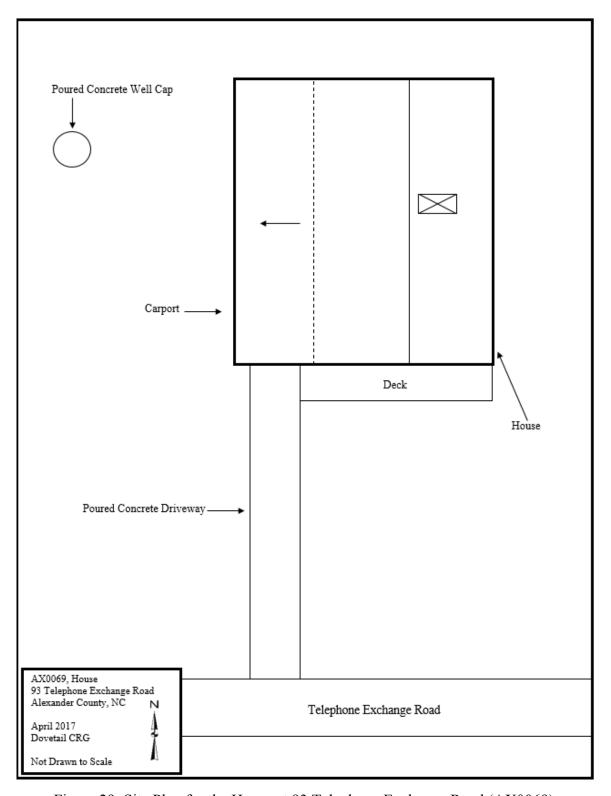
Site Plan for the House at 93 Telephone Exchange Road (AX0069).
